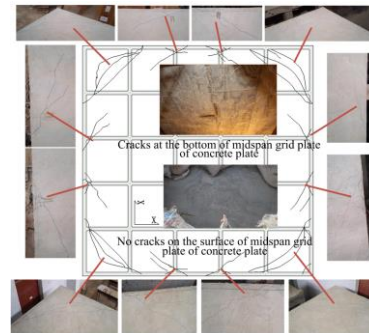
Distribution of cracks on concrete plate surface of hollow sandwich plate
